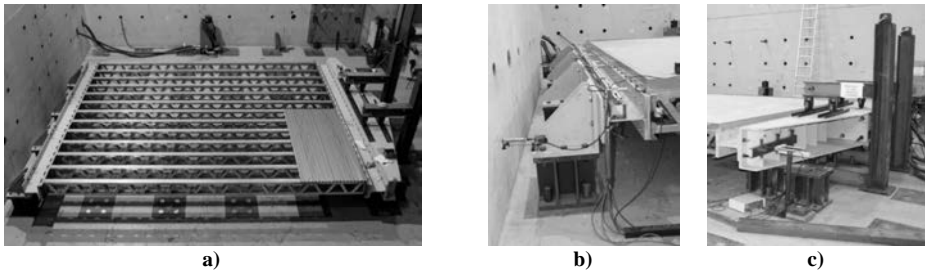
a) View of test frame and test system; b) fixed constraint; c) load application system.
